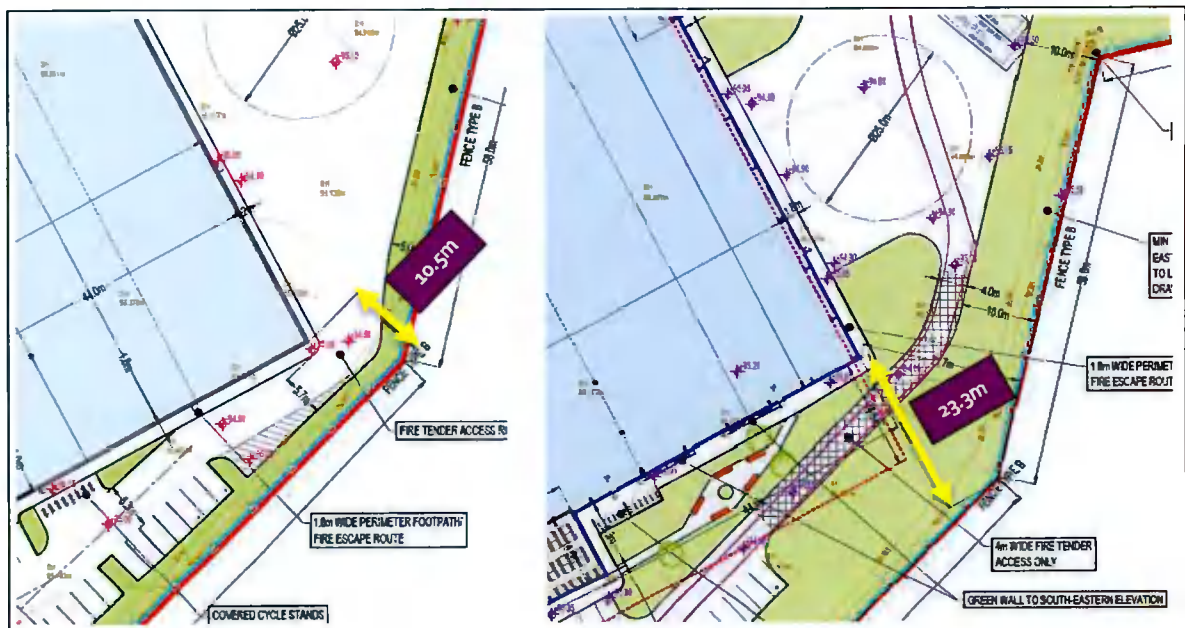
Extract from the Previously Proposed Site Plan (Left) and the Now Proposed Site Plan (Right)
